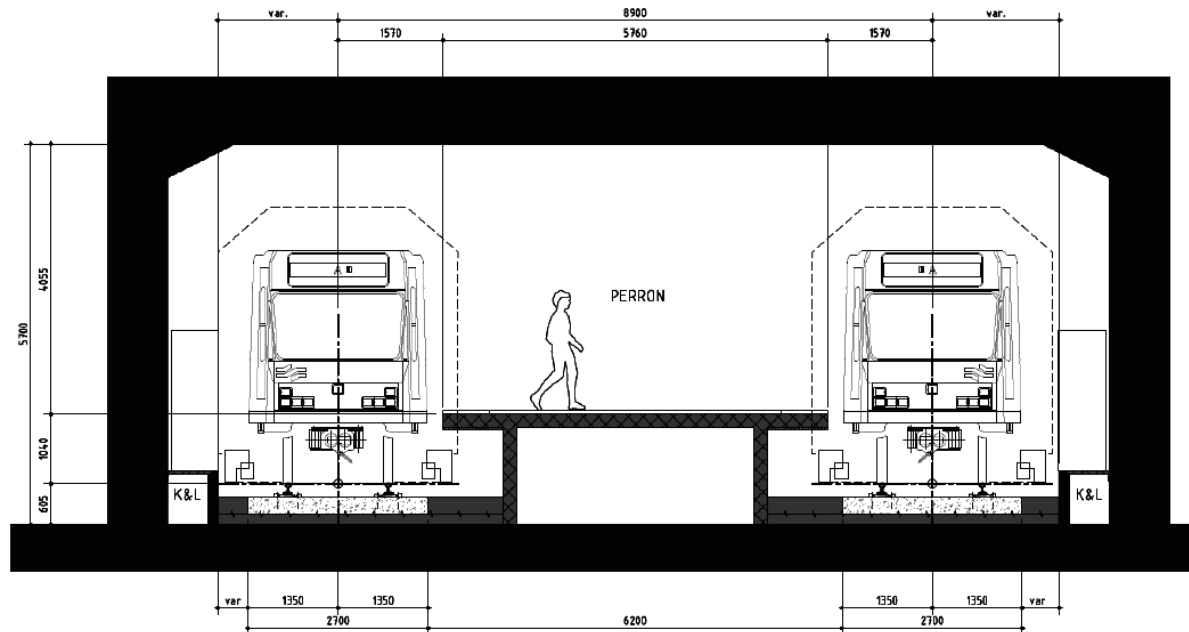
Platform Layout GVB Metro (Gemeente Amsterdam, 2017)
